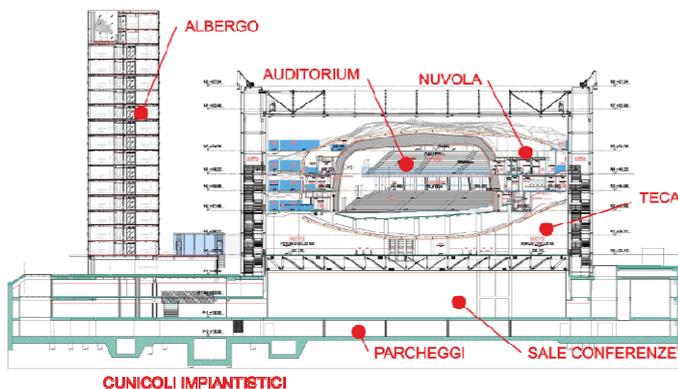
cross-section of "the cloud"/ sezione trasversale della "nuvola"
